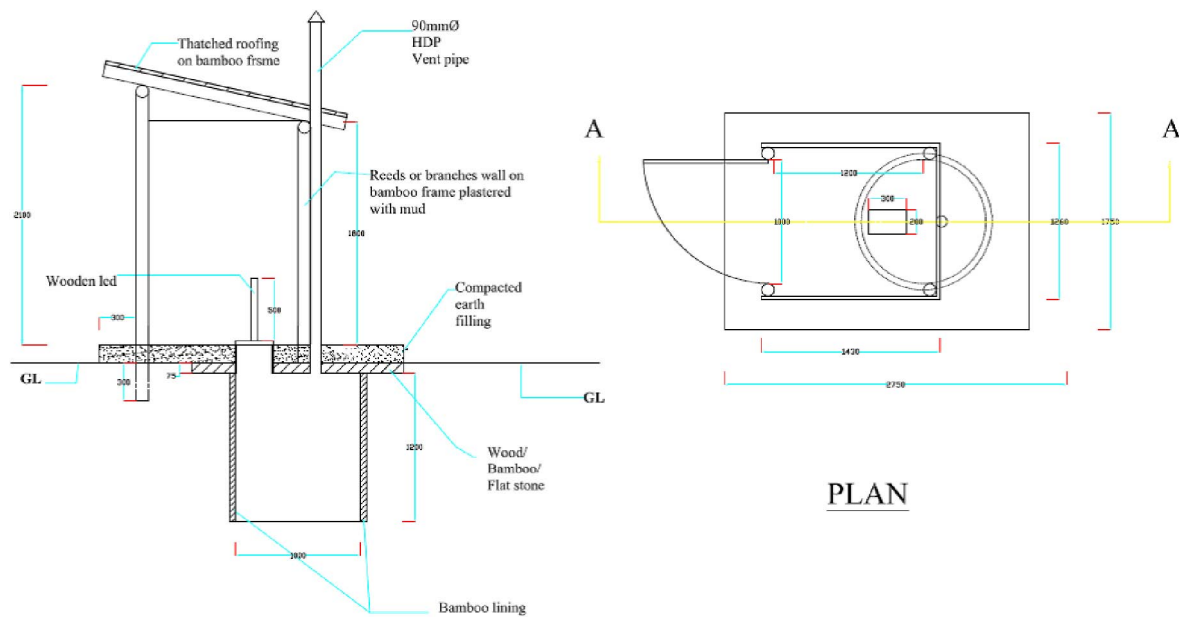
VIP bamboo lining toilet with floor plan (source: DWSS)
